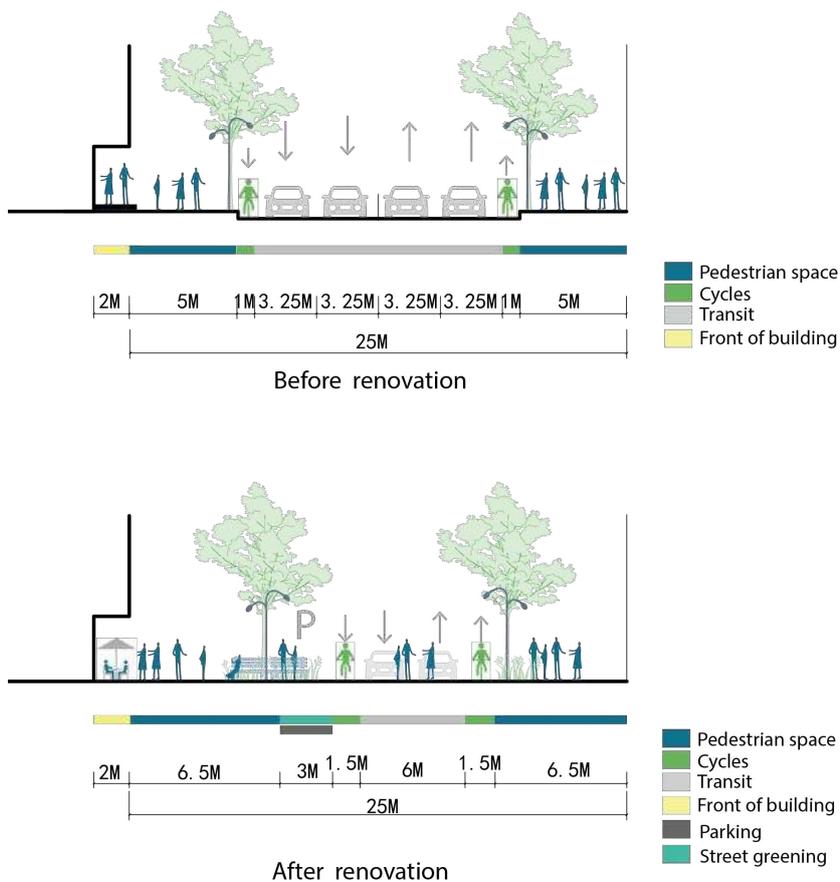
Section of Tianhe Nanyi Road before and after renovation(Zhengjia Plaza part) (Source: Completed by author)
